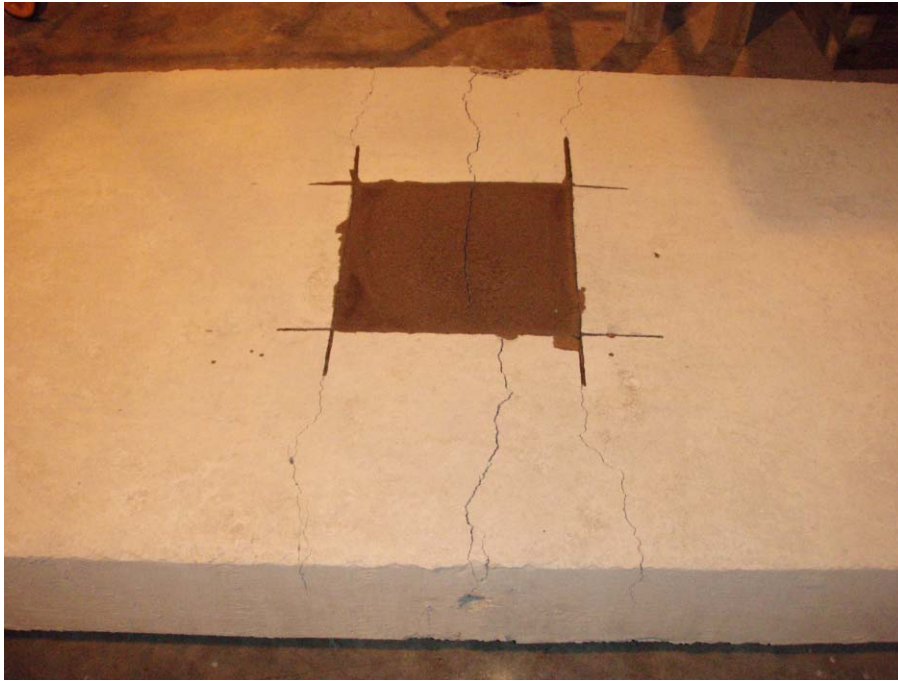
Three-Point Loading – Pavemend 15.0 – Small, Shallow
